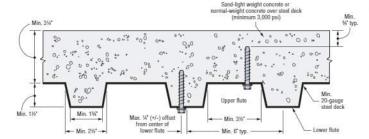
Installation of 1/4"-Diameter Anchors in the Soffit of Concrete over Metal Deck
